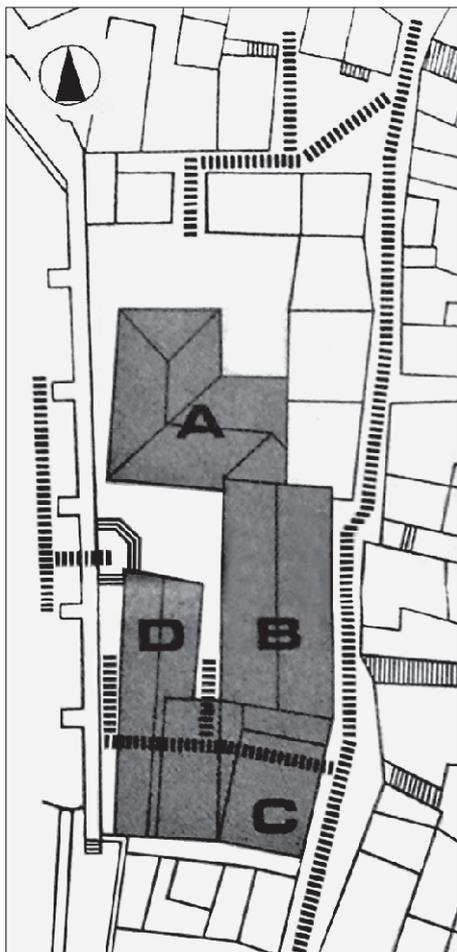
RENOVATION AND RECONSTRUCTION PROJECT OF CULTURAL CENTER (1979-82). SITE PLAN – THE EXISTING BUILDINGS "A-B", "D" AND THE INTERPOLATED PART "C".
